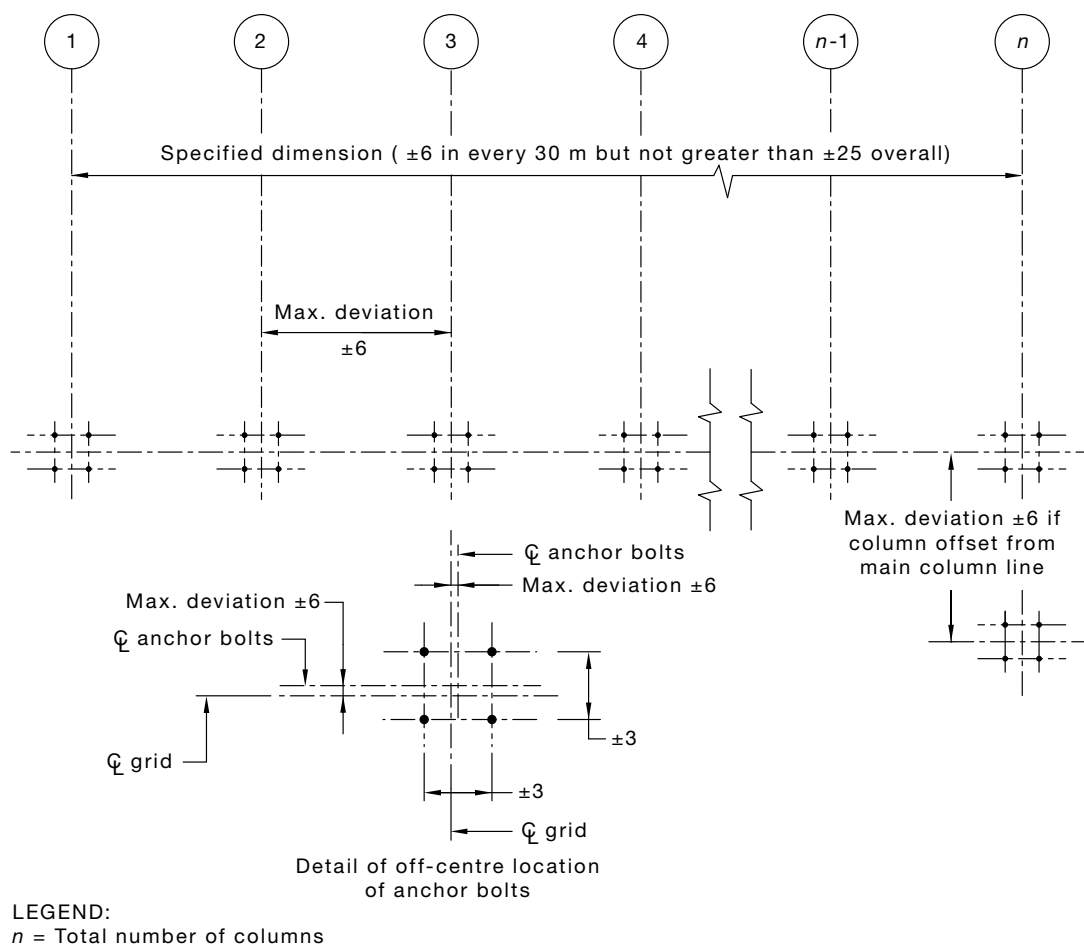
TOLERANCES IN ANCHOR BOLT LOCATION
